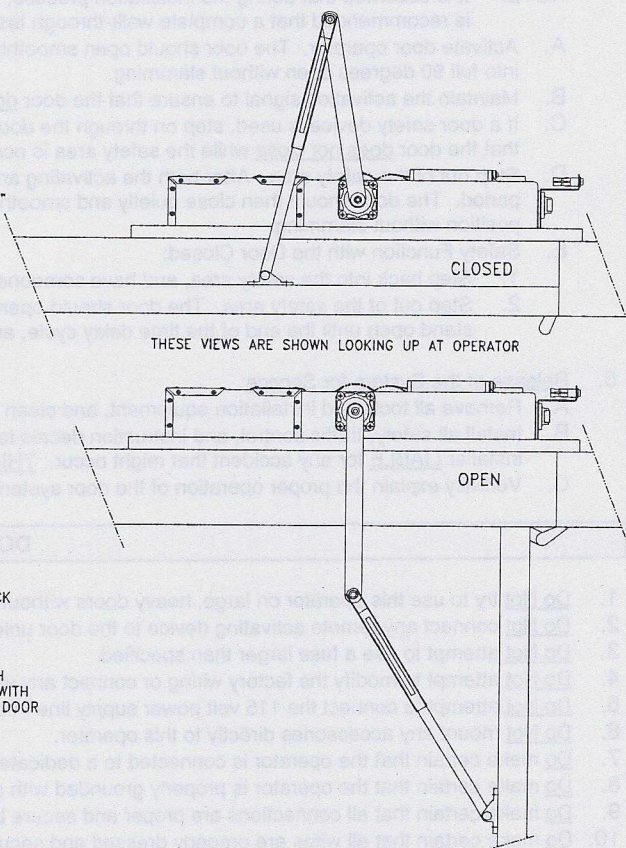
OPERATOR INSTALLATION – PUSH ARM
